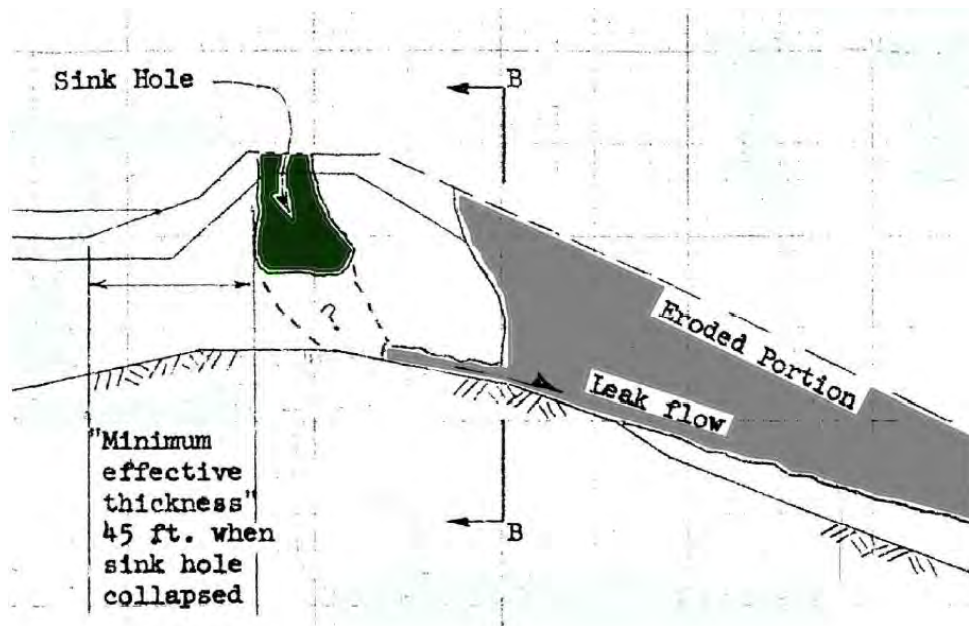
Section through embankment at sinkhole location. Note approximately only 45 ft of embankment was retaining the reservoir.
